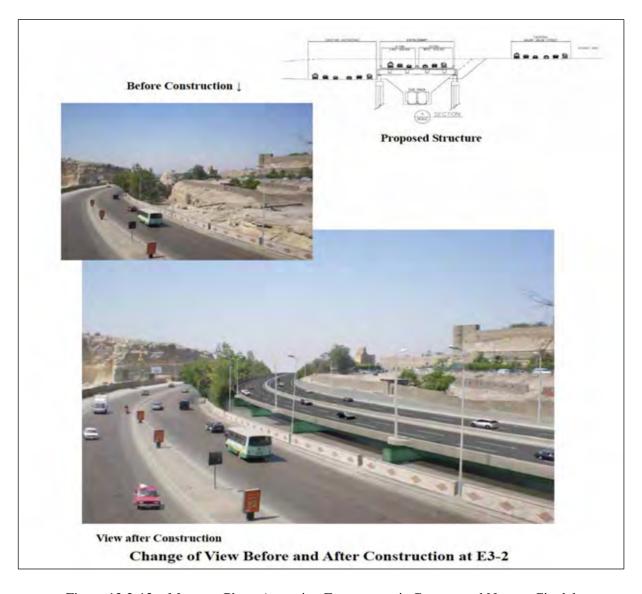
Montage Photo Assuming Expressway is Constructed Next to Citadel
